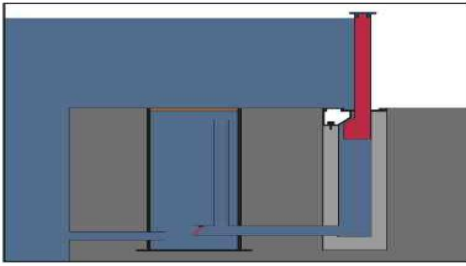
Hydrostatic ensures the barriers stay in until flood subsides.
